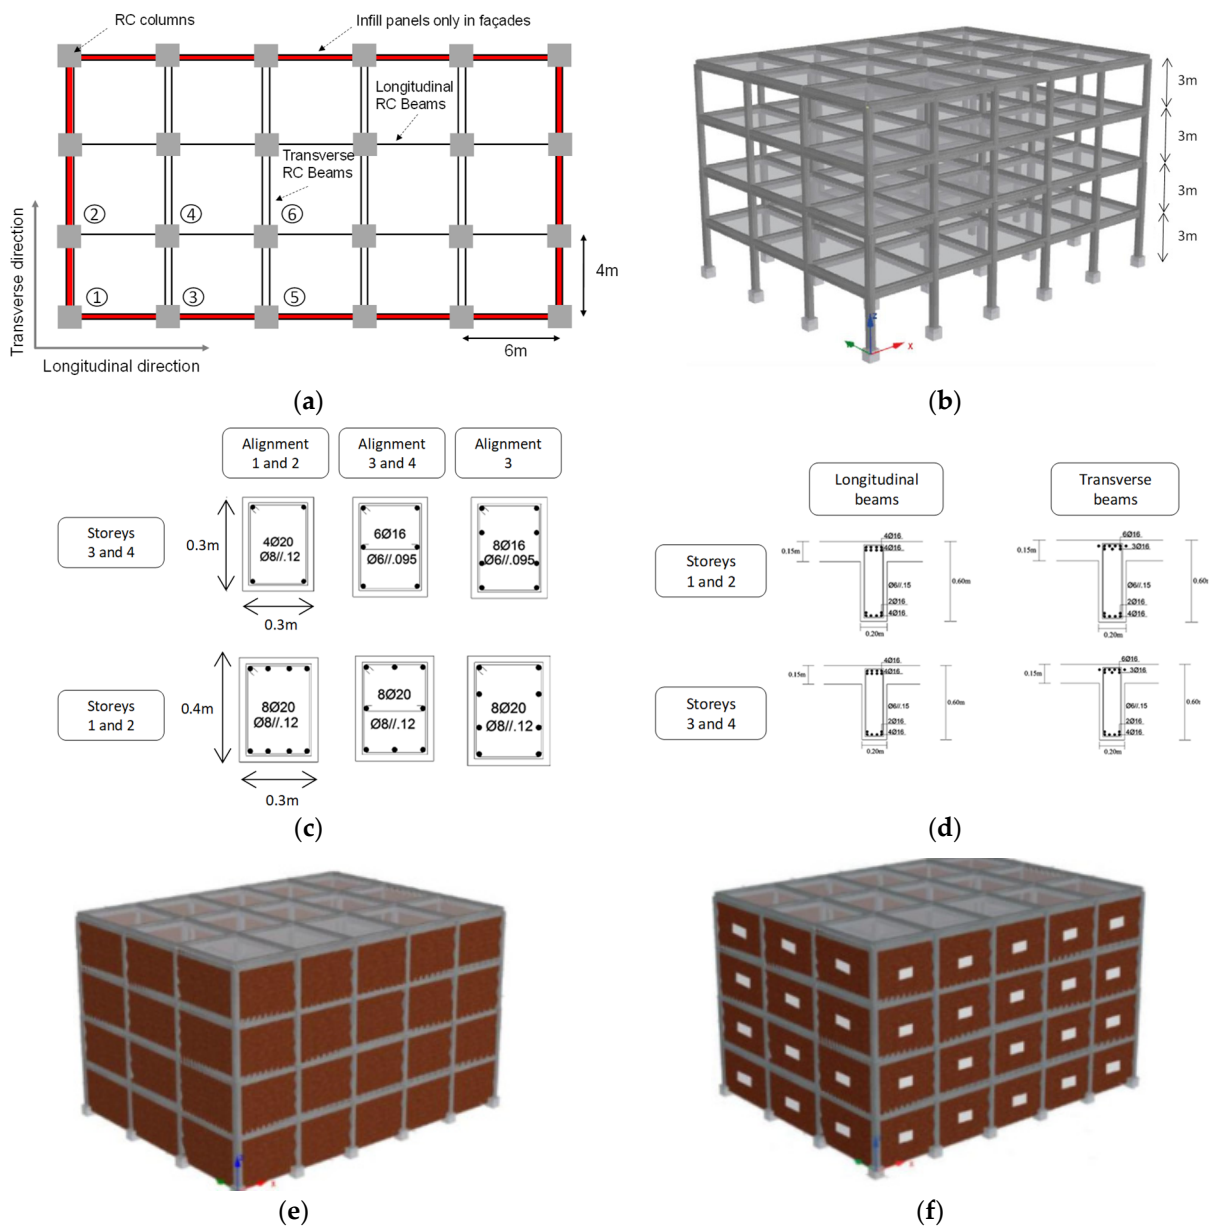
Case study: (a) plan view; and (b) general view of the BF model; (c) columns' cross-section; (d) beams' cross-section; (e) FI model; and (f) PI model.
